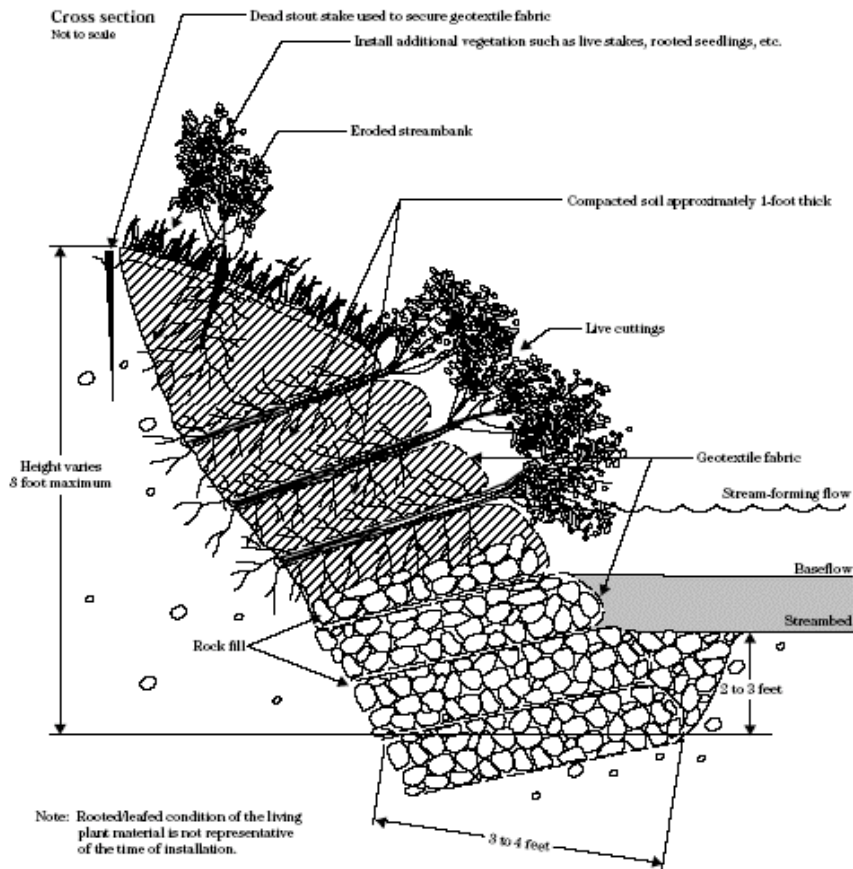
Typical detail drawing of a geotextile vegetated soil lift for use in streambank stabilization and revegetation (USDA-NRCS Field Engineering Handbook 1996).
